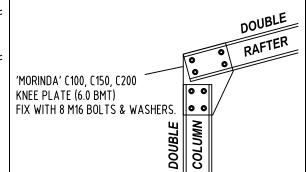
EAVE BRACKET CONNECTION
